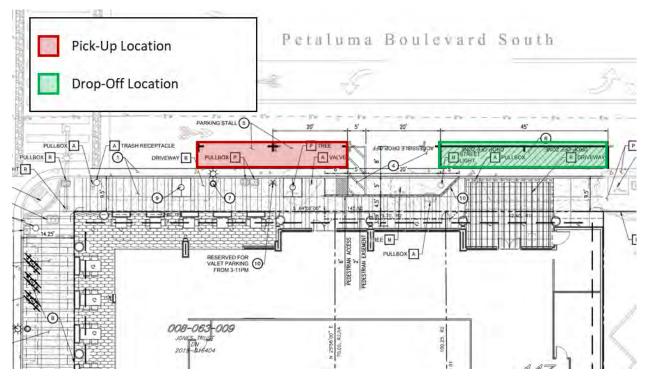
Site Plan detail highlighting the vehicular pick-up and drop-off location.
